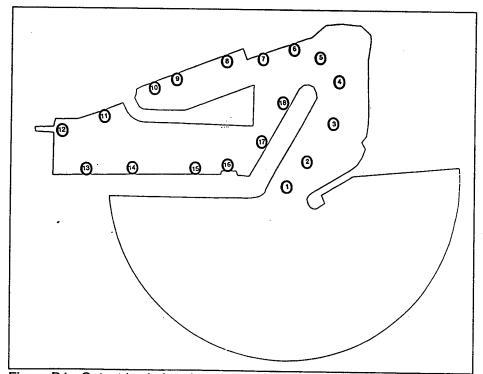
Output basin locations for Proposed Plans 6 and 6a
